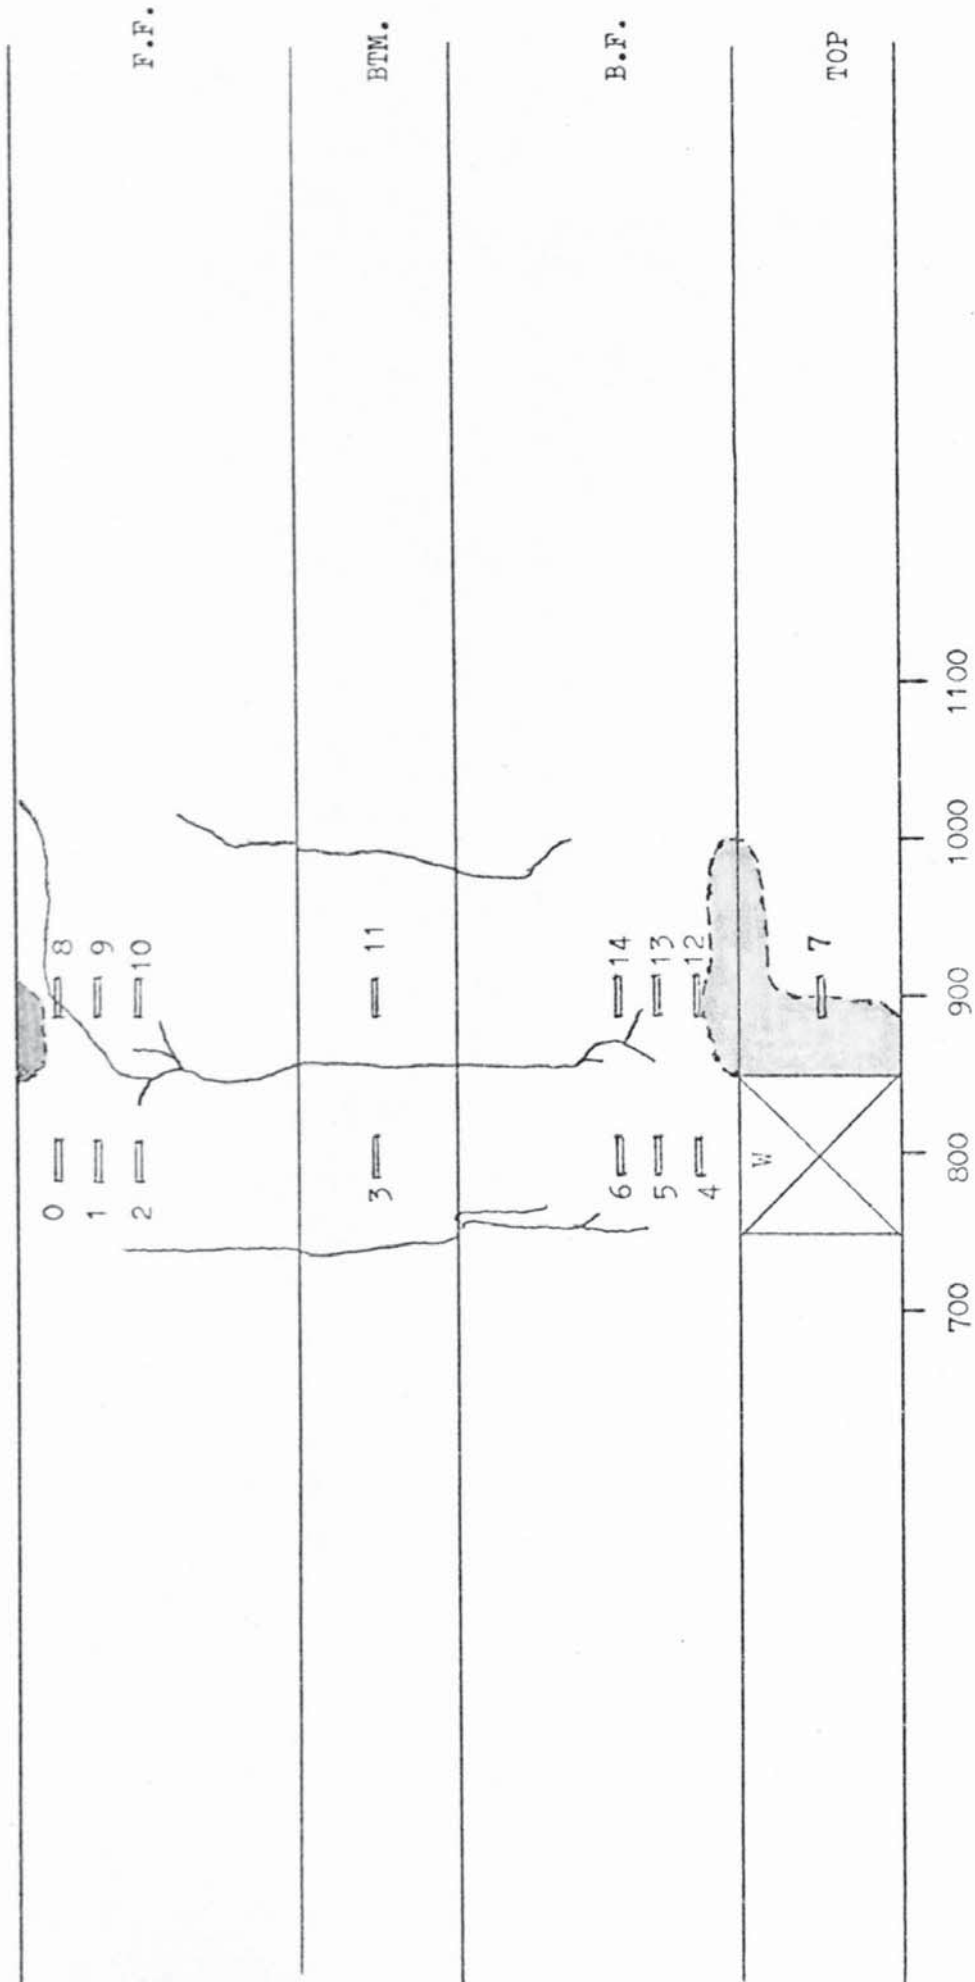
FAILURE CRACK PATTERNS - BEAM 25 ( MODE 1 )
